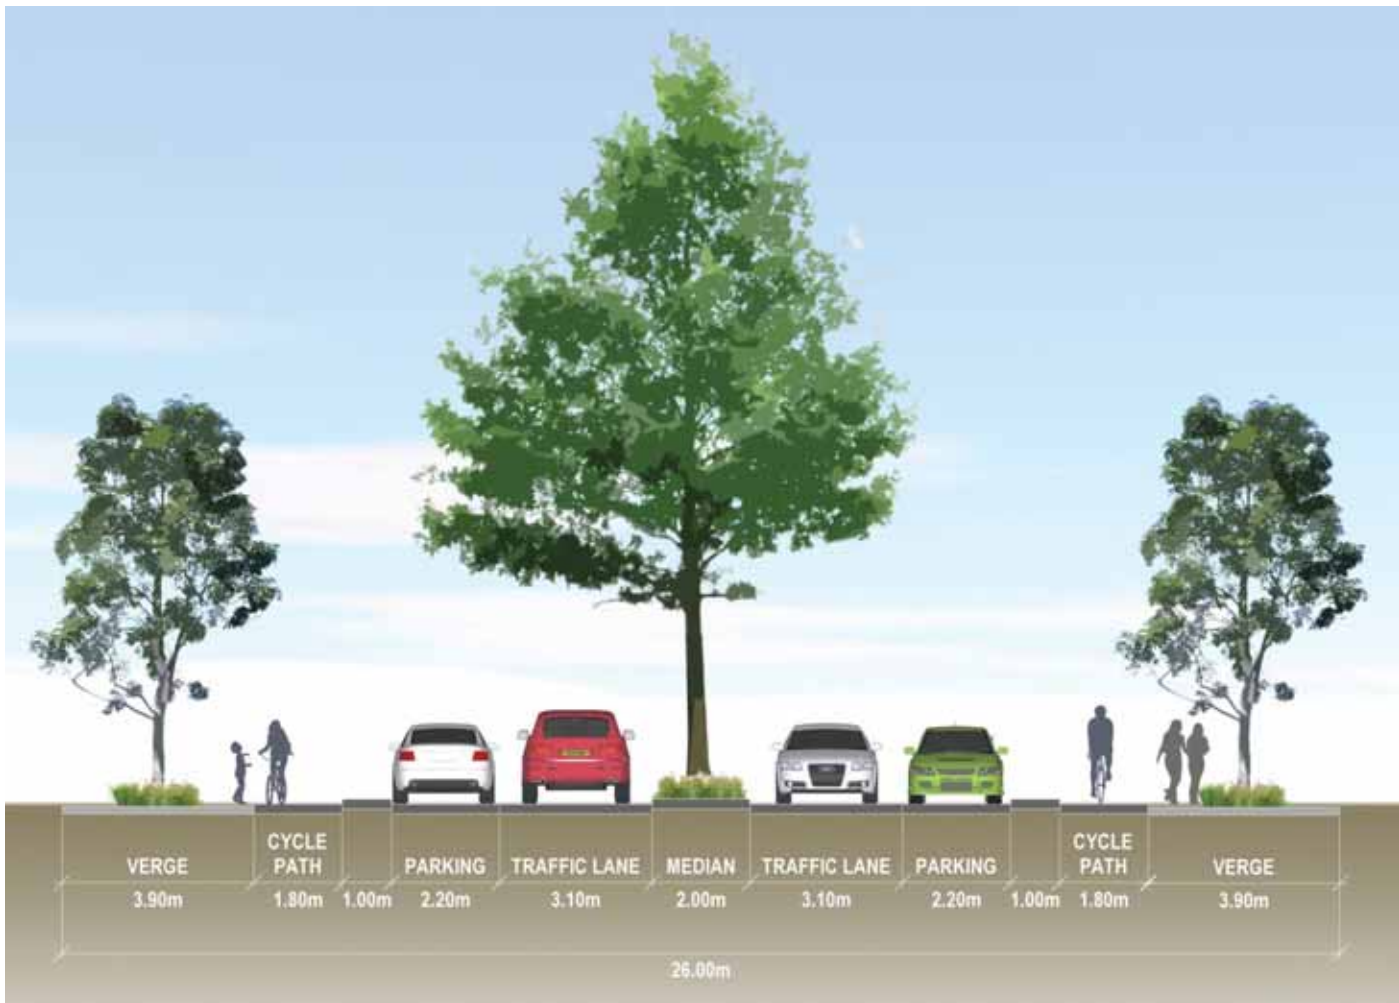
Scarborough Beach Road Conceptual Cross Section (East of Stephenson Avenue)
